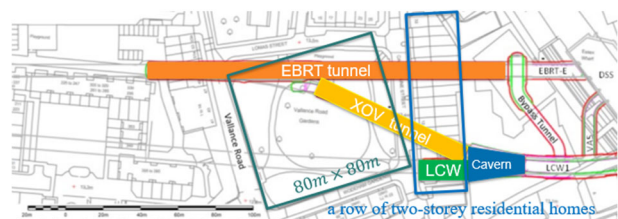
Plan view of Whitechapel Station area and layout of surrounding buildings.
